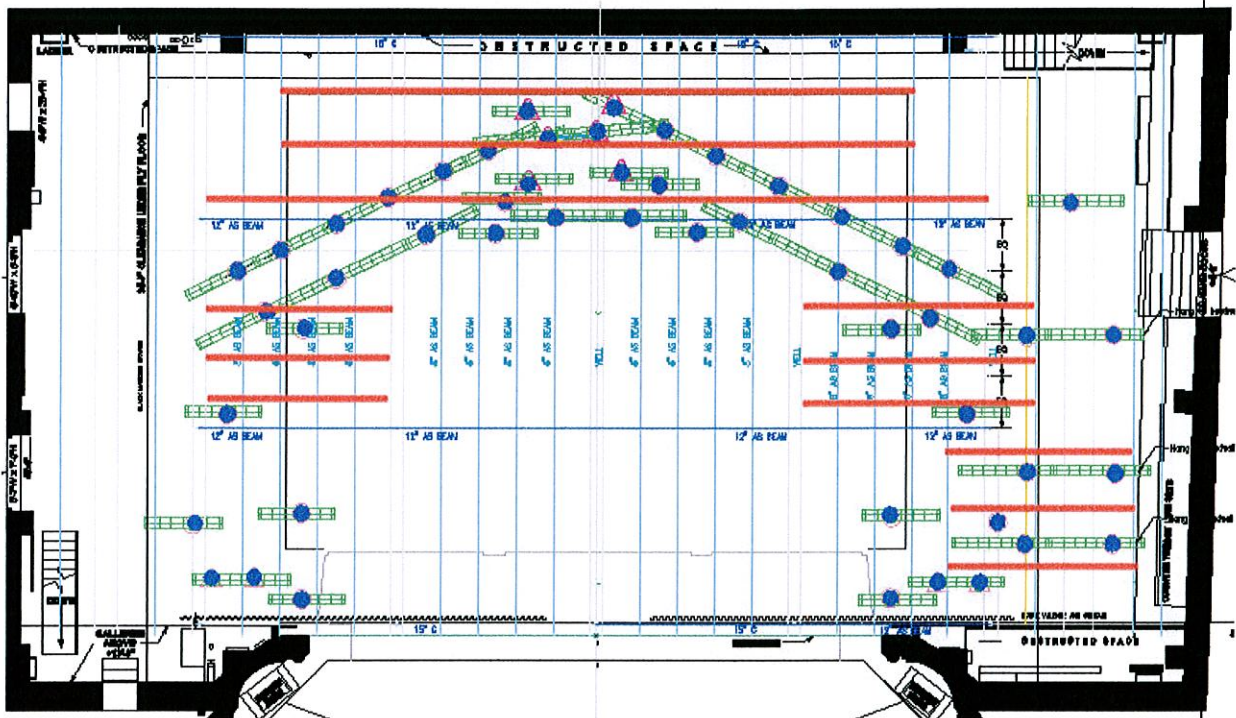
Divas/HHH Show Gridiron Beam Bracing Plan
